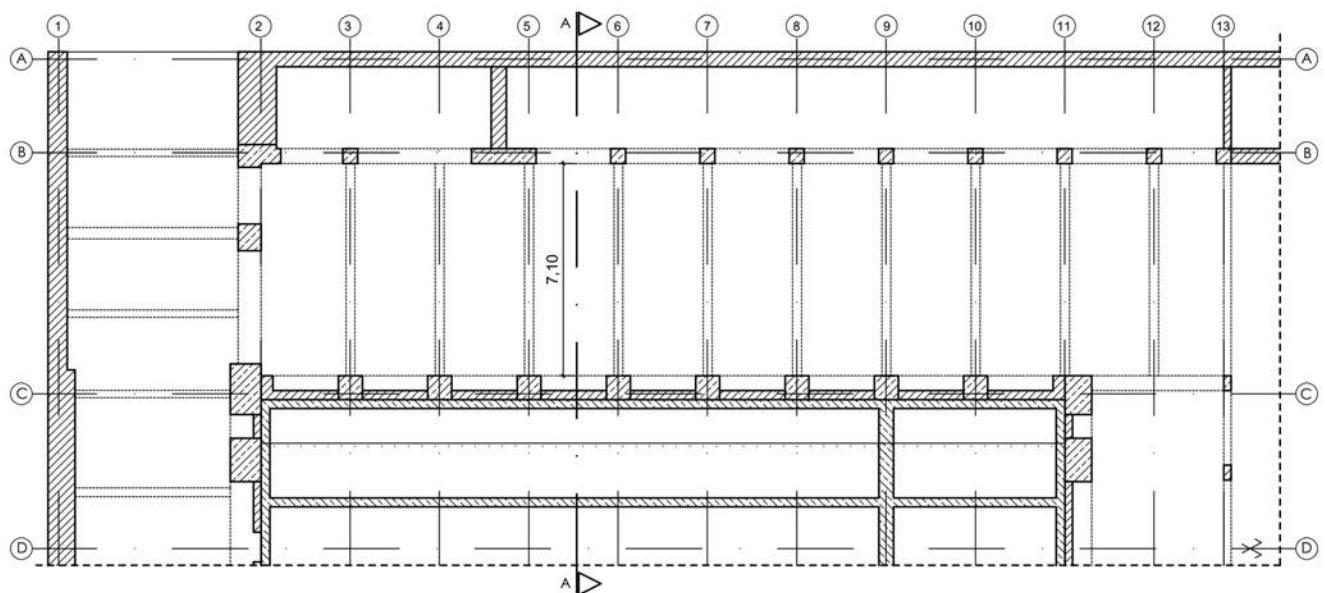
Partial groundfloor plan of the Aquarium, based on building permit drawings and onsite investigation, also indicating section A-A.
